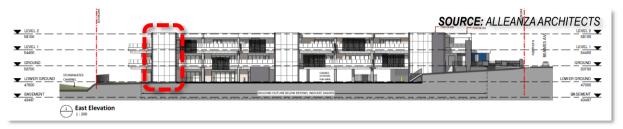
EXTRACT OF PROPOSED DEVELOPMENT LONG SECTION AS AMENDED (MAXIMUM BREACH OUTLINED)
